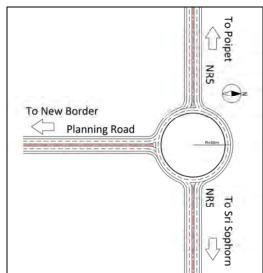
Intersection with the Access Road to the New Border Facility (Round About)
